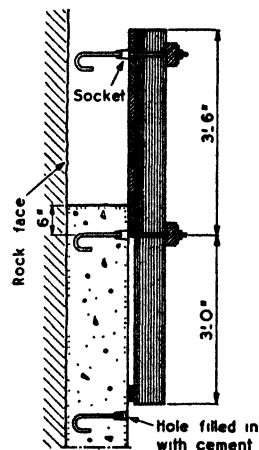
HIGH WALL SHUTTERED ON ONE FACE
